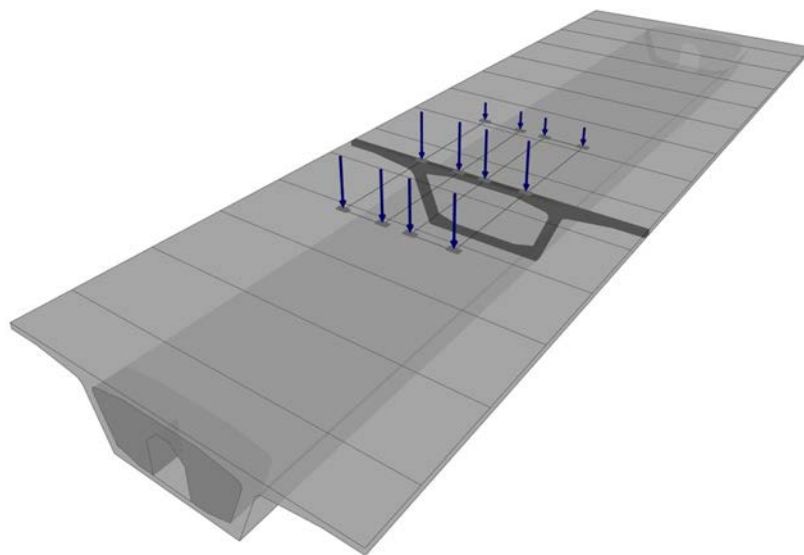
Truck Loads on a Single-Cell Box Girder Span
